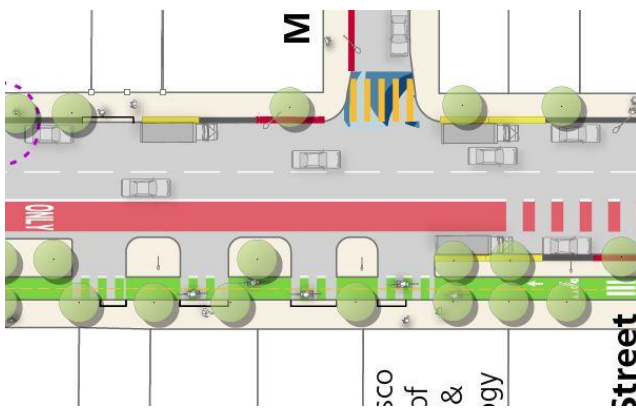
Typical Plan View of Folsom Street between 8th Street and 6th Street
